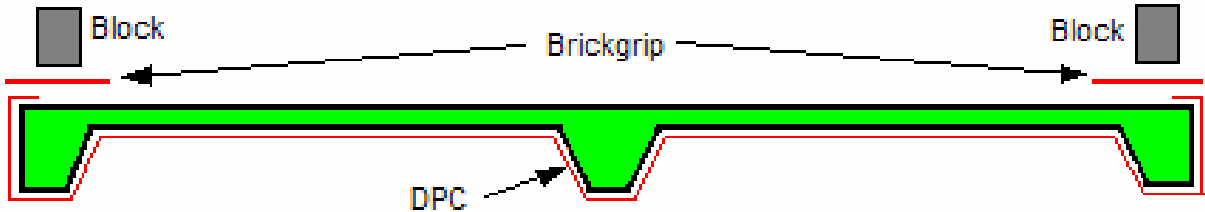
DAMP PROOF COURSE FOR RAFT FOUNDATIONS
